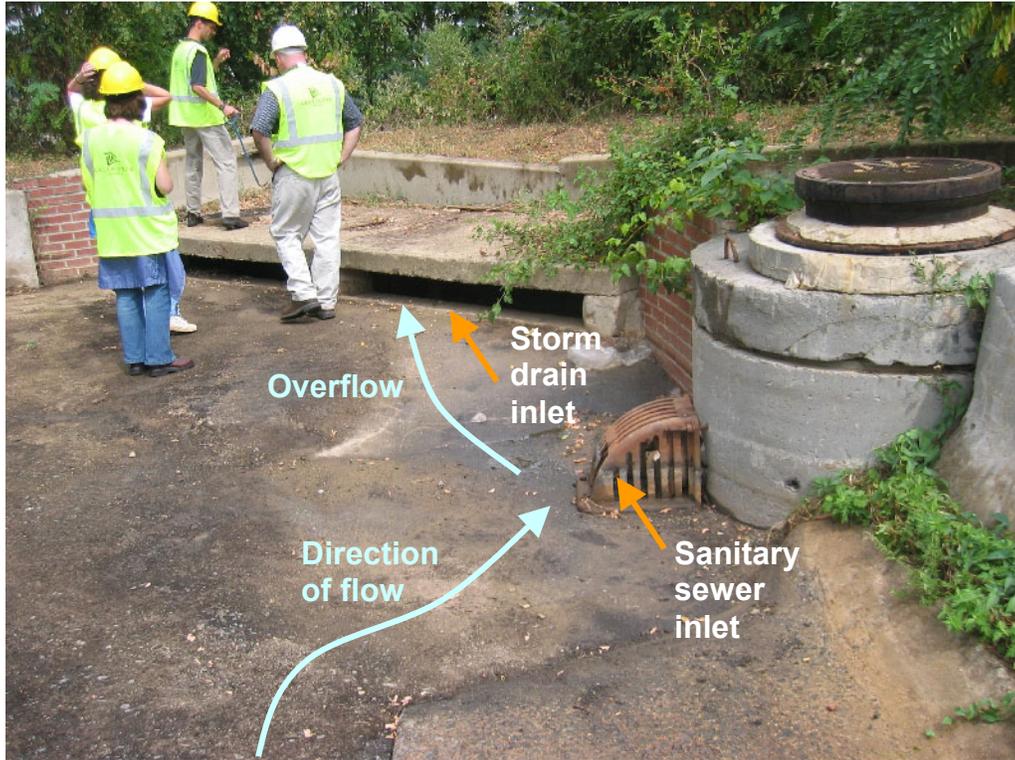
Runoff from a material stockpile area drains to a sanitary sewer inlet, with bypass flows entering the storm drain inlet.
